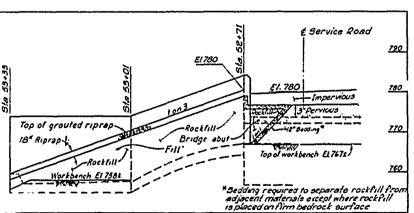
DETAIL OF SIDE-HILL DRAINAGE CHANNEL LOOKING DOWNSTREAM Not to Scale
